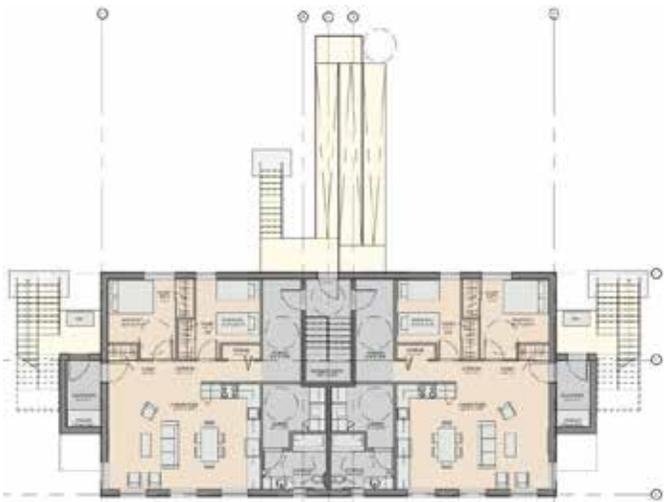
Six Plex: First Floor Plan with wheelchair ramp (Design: EVOQ Architects and W Semple)
